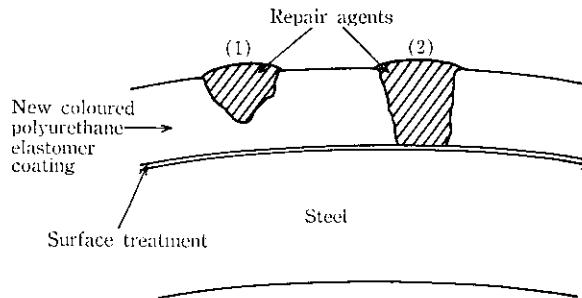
Repair methods of damaged areas of new coloured polyurethane coated steel structures
